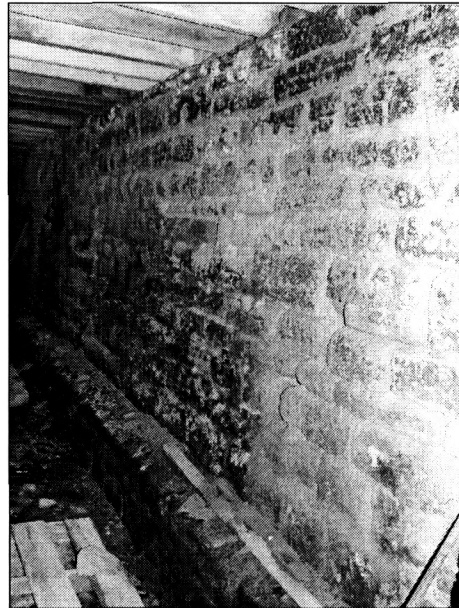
Profile of press house stone foundation wall with exposed footing at lower left, view northeast
